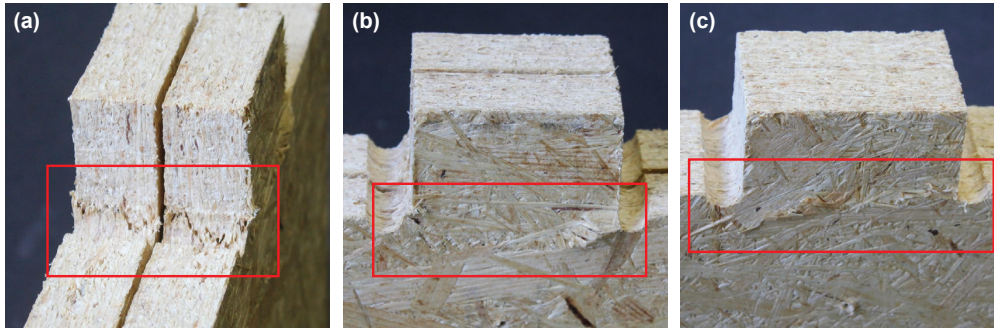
Failure pictures of T1-50 specimens: (a) Side view (b) Front view (c) Back view.
